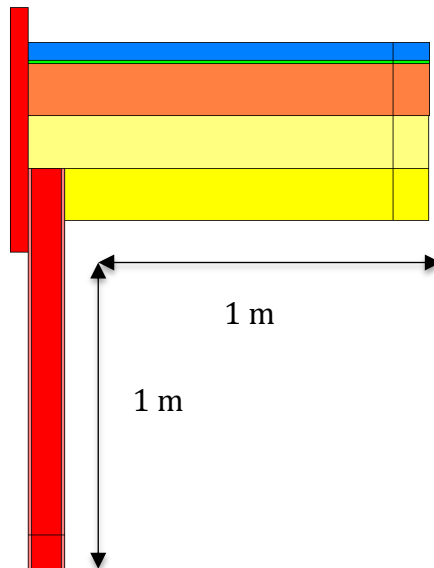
SECTION ROOF-WALL CONNECTION THERMAL BRIDGE
